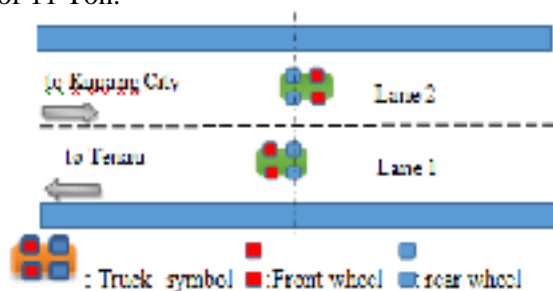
Truck loading on top slab of box-girder bridge. Both rear wheel of truck located on mid-span of bridge as combination 1.
